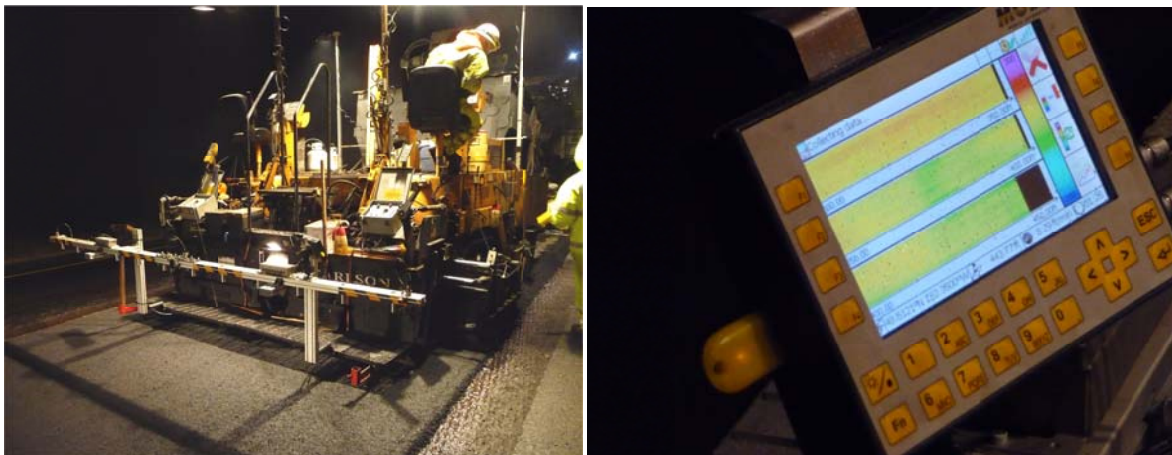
Pave-IR Thermal Imaging System. (Photos: Study Team)
